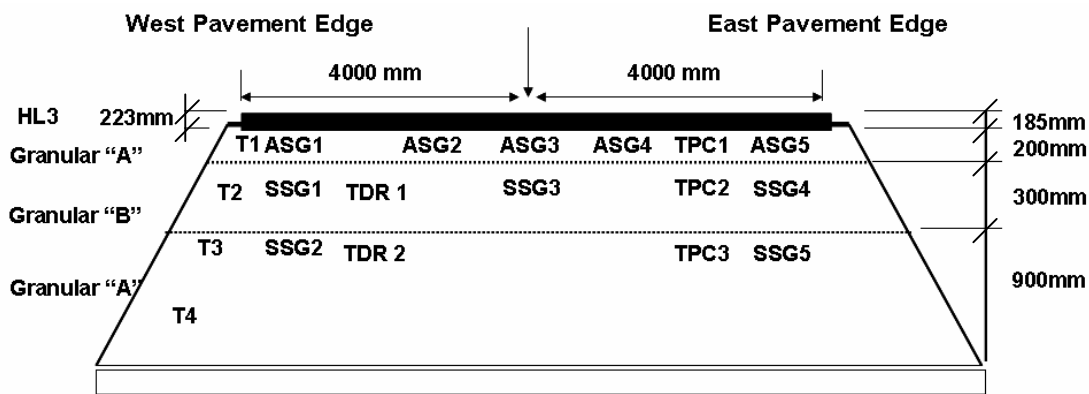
Instrumented Section Profile and Sensor Distribution Layout
